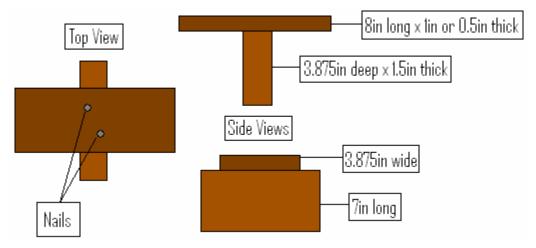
shows a schematic of the joint withdrawal test specimen dimensions.
